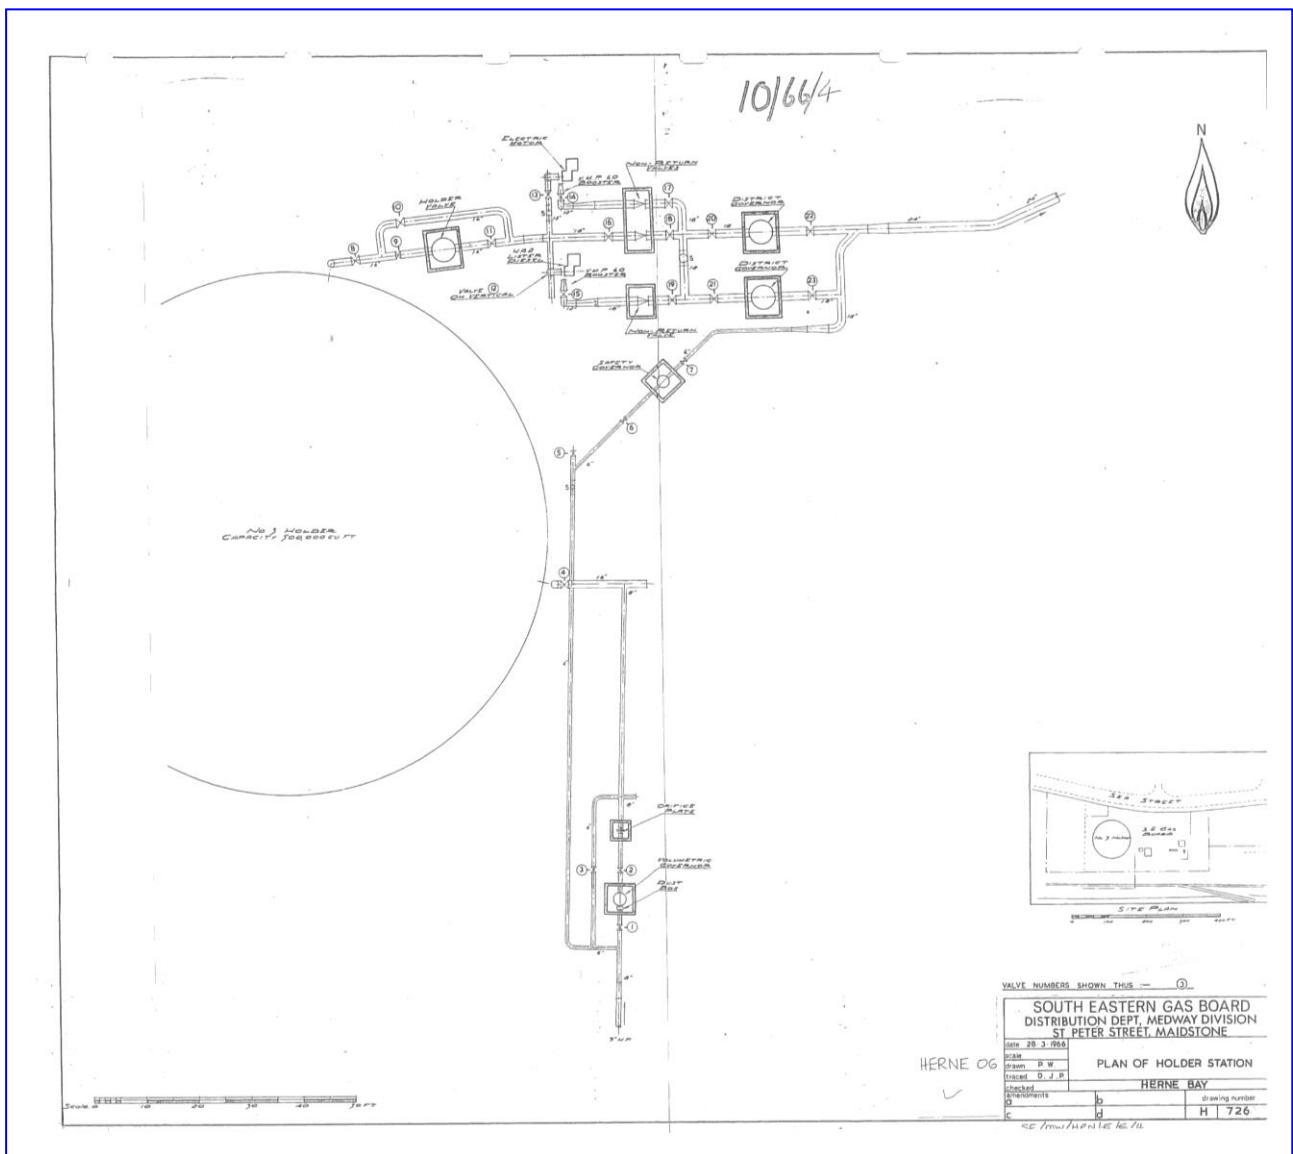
Detailed archive plan of gasholder and pipe network, 1966
